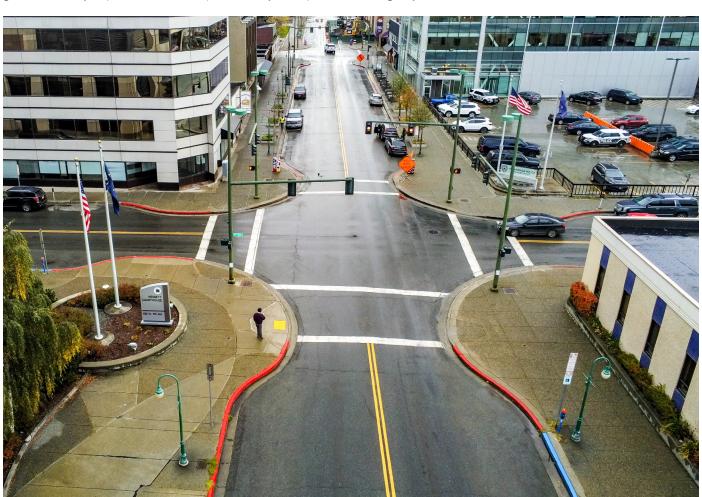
Curb Bulb-outs in Downtown Anchorage, Alaska
